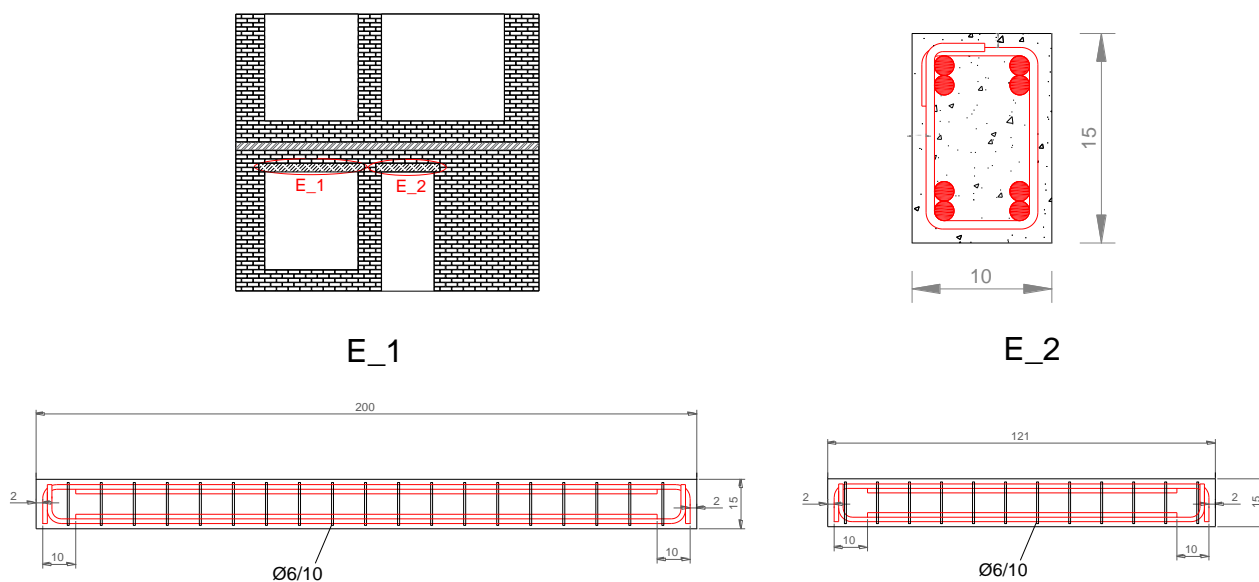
Reinforced concrete lintel details: East façade inner leaf. Units of cm.
